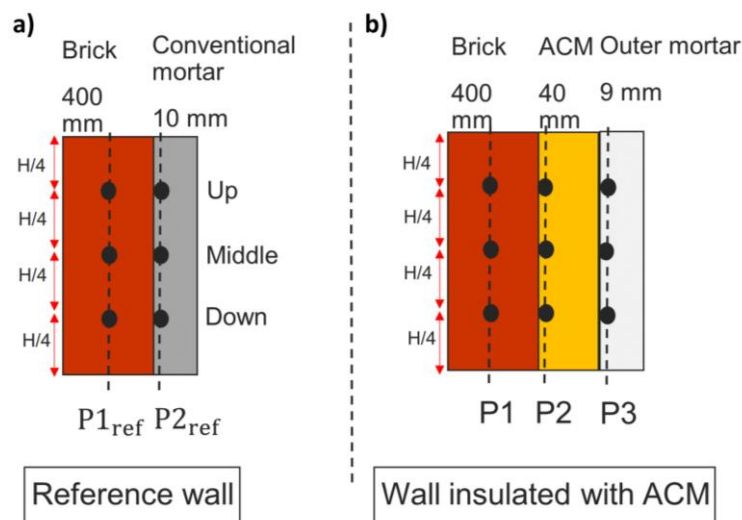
Schematic diagram showing the arrangement and labeling of sensors in the reference test wall (a) and the wall coated with ACM (b). Three sensors were evenly distributed at each position along the height (H) of the test walls: up, middle, and down. Both test walls were externally coated with white water-repellent paint. Images of the sensors at positions P2 and P3 can be seen in Figure 4c and Figure 4d, respectively.
